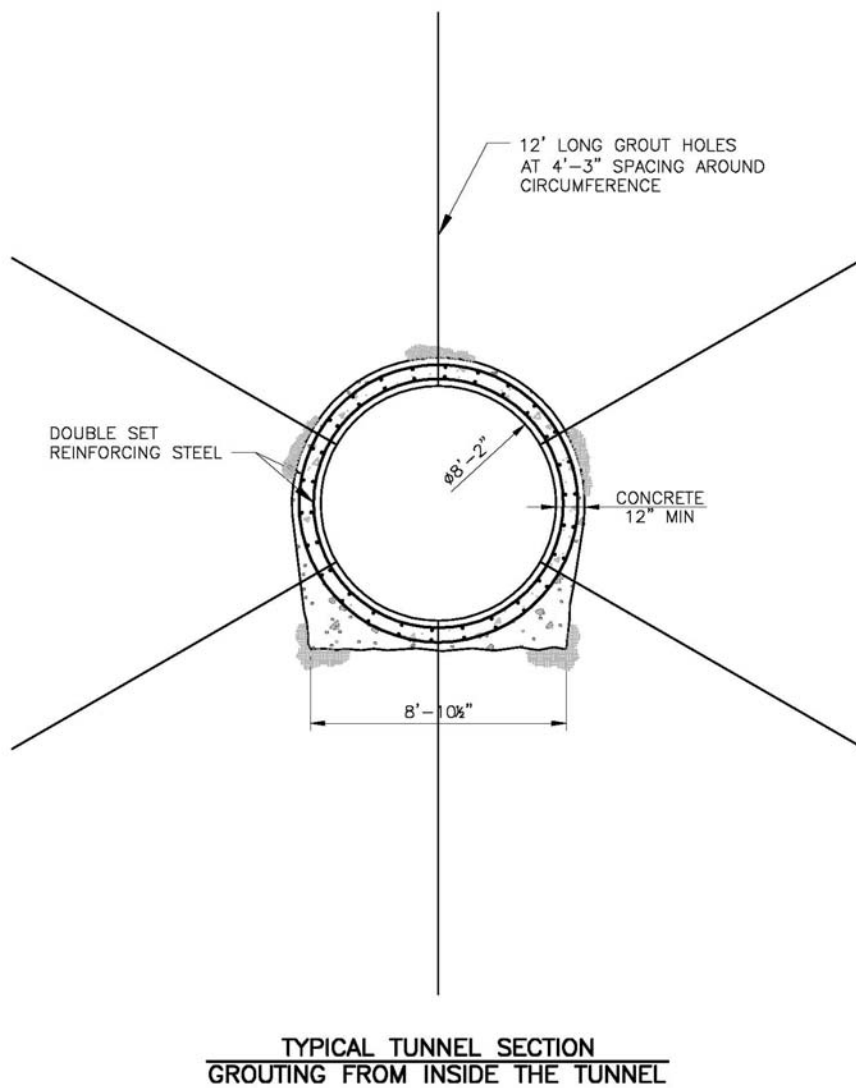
Tunnel Cross Section Showing Grout Holes from within the Tunnel
